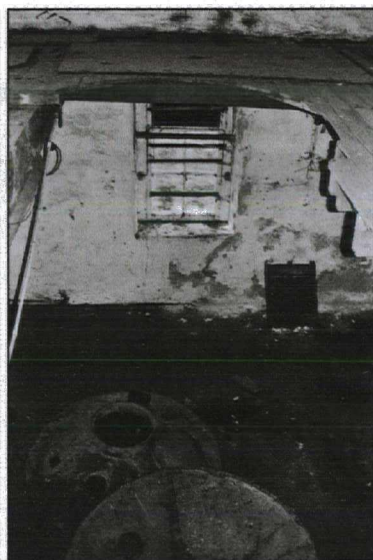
(94: 4/10) Room 2/4: sectional view towards level 1, from the north
